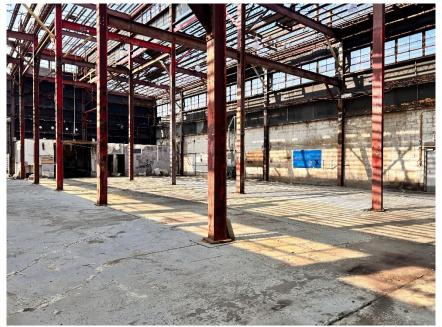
Conrete cover slab in 725 Clinton Street Building (facing southwest).
